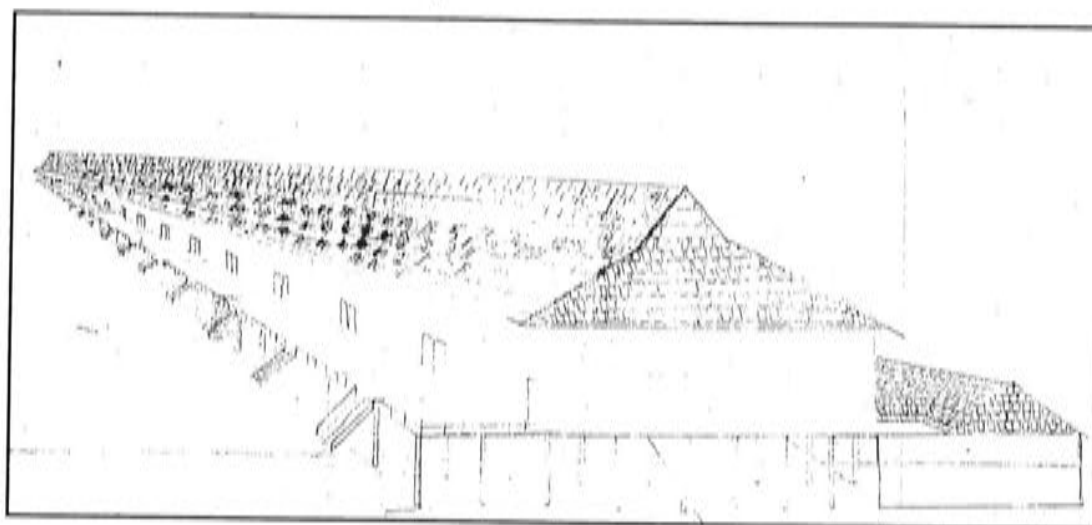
Sketch-plan of the general appearance of the proposed Stamang 'tourist' longhouse.
